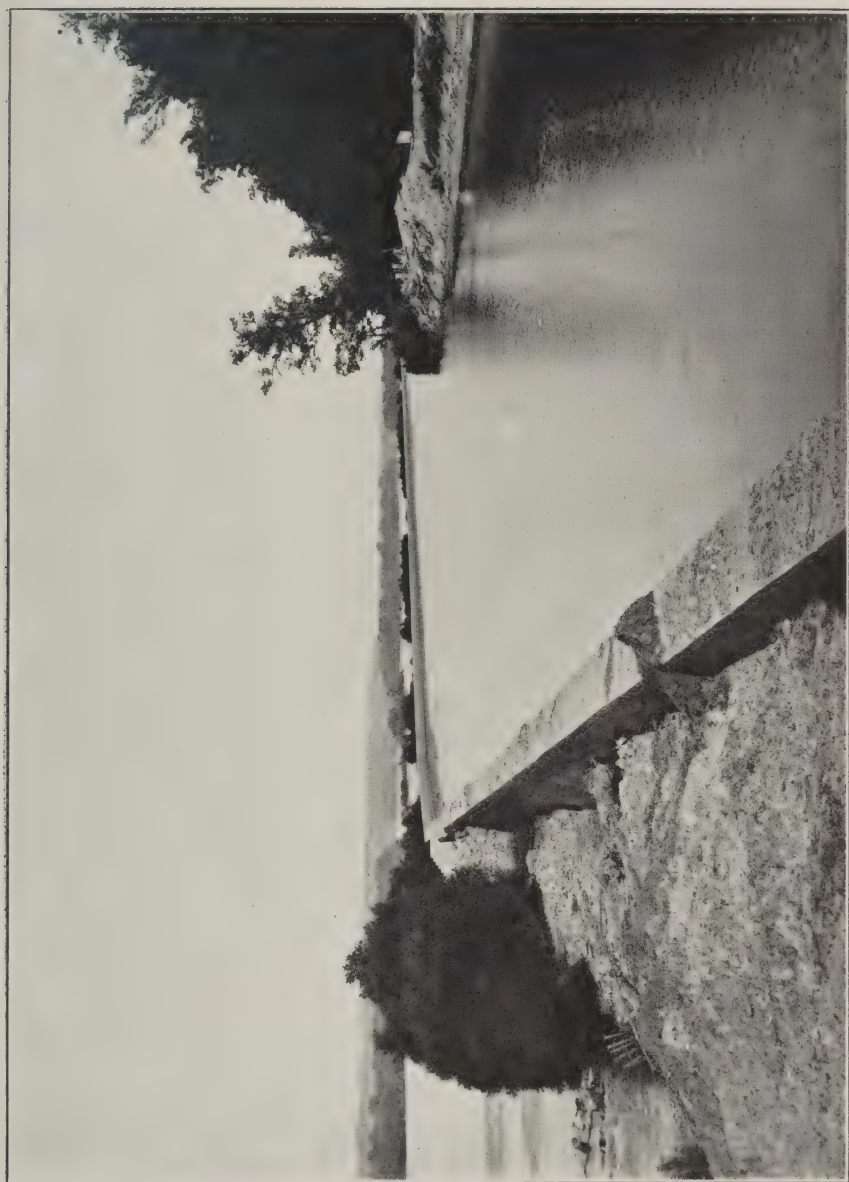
Lower end of concrete wall, showing Colbert Shoals in the distance.
